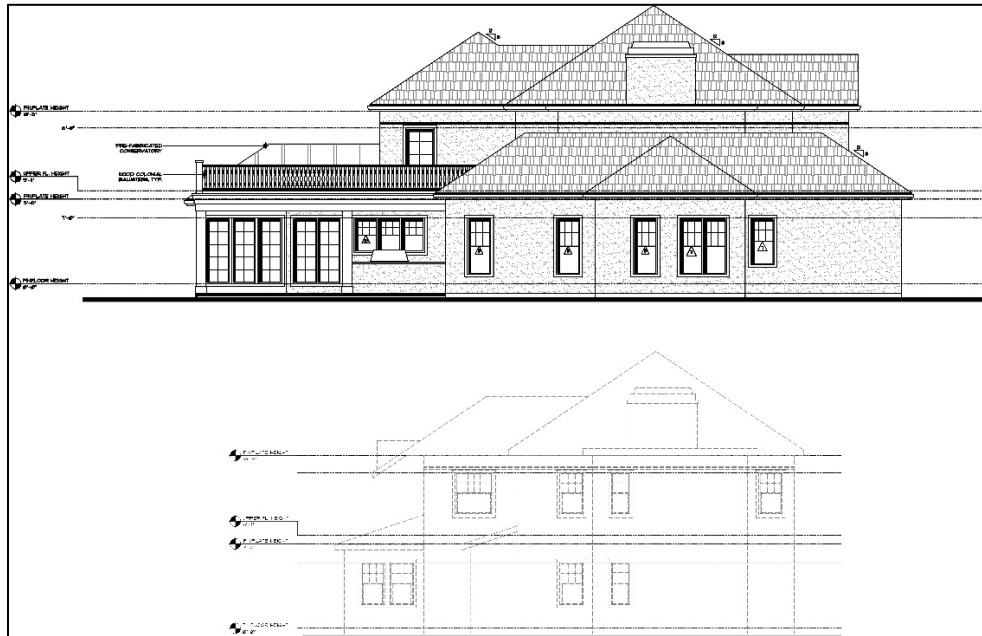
West elevation showing existing facade (bottom) and proposed modifications, including new east wing, lanai, and conservatory (top).
